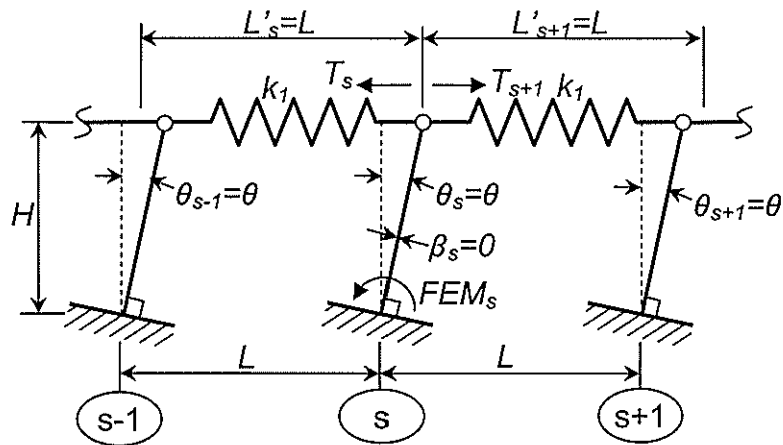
Typical Element in Straight Segment of Fixed-End Primary Structure
